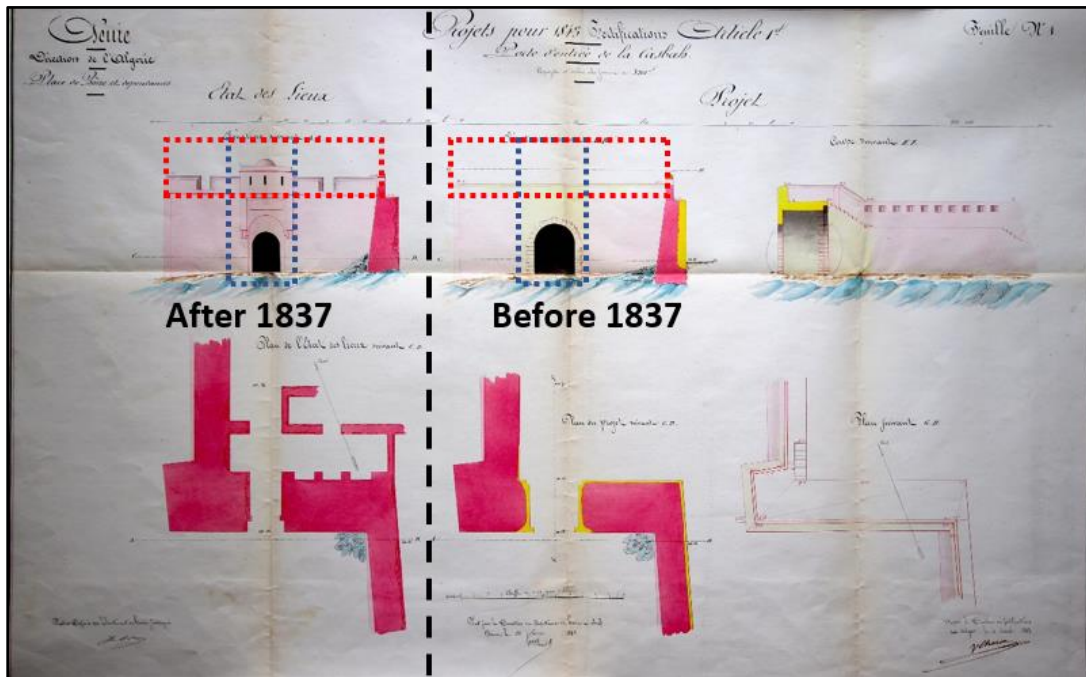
plan and elevation of the casbah before and after its reconstruction. Source: Vincennes Military Archive treated by author, 2023
